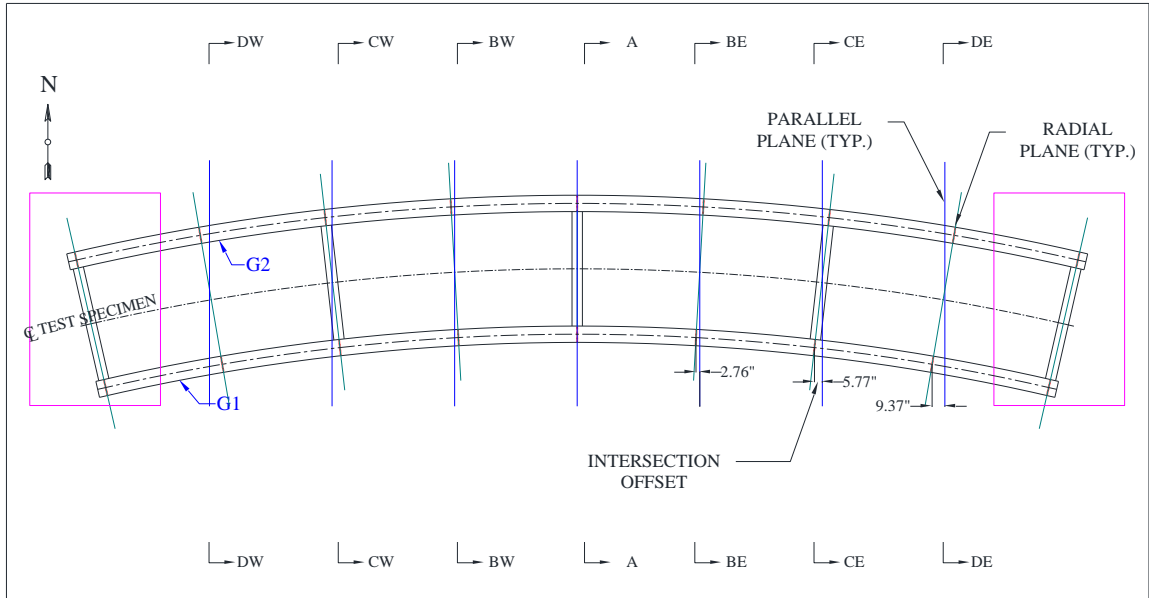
Plan view of the test specimen showing parallel planes and radial planes and the intersection offsets between them
